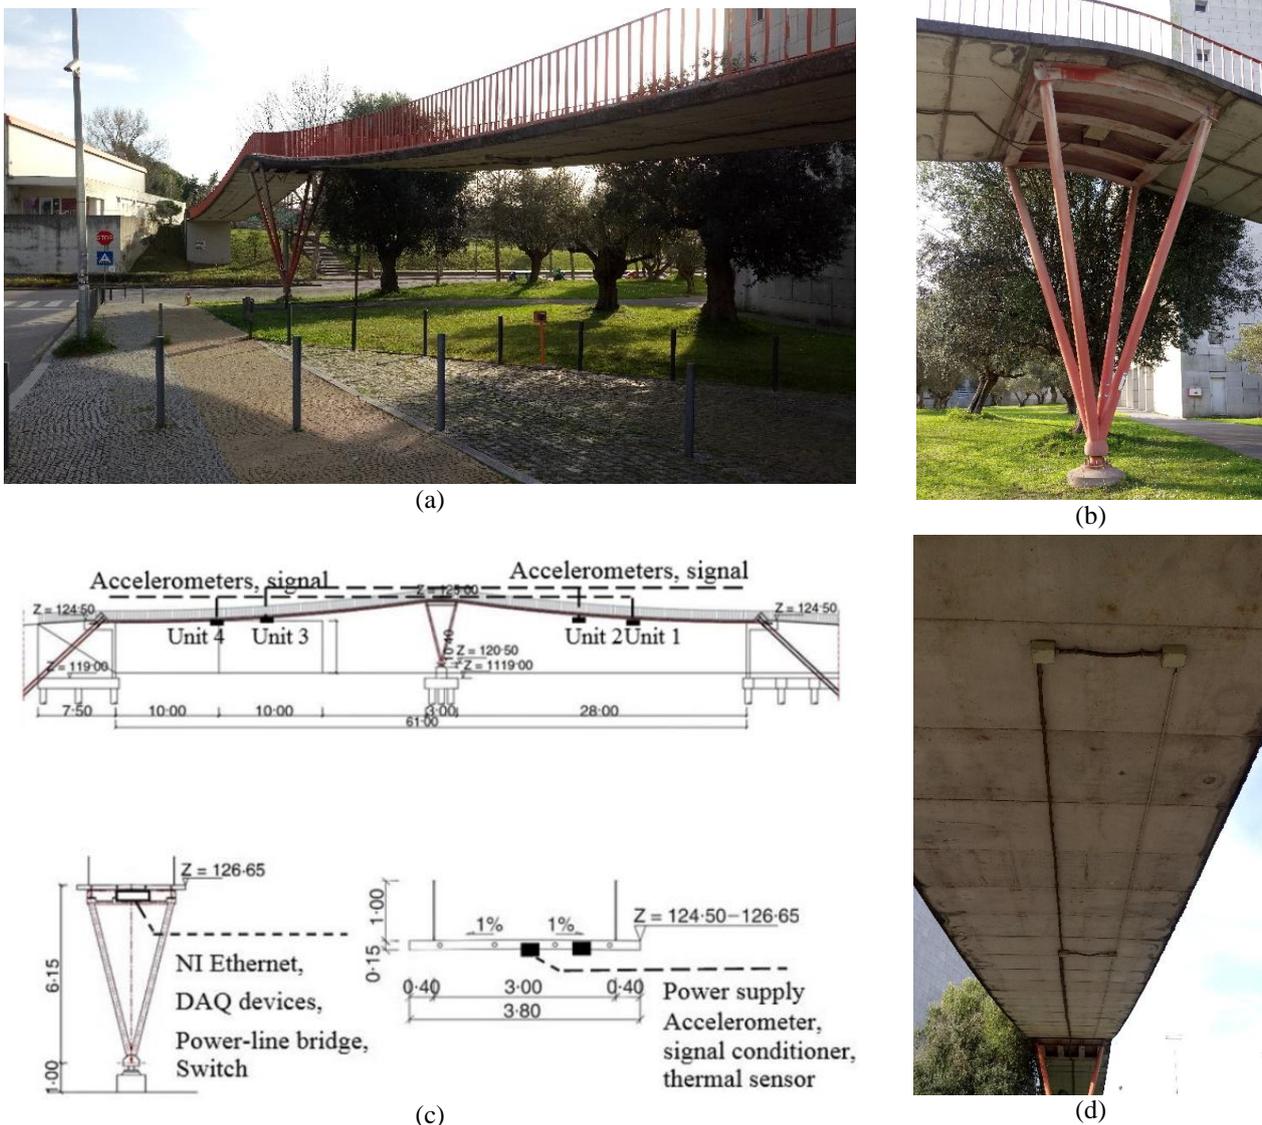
Footbridge (a) overview of the structure; (b) intermediate support detail; (c) monitoring system layout; (d) monitoring system
